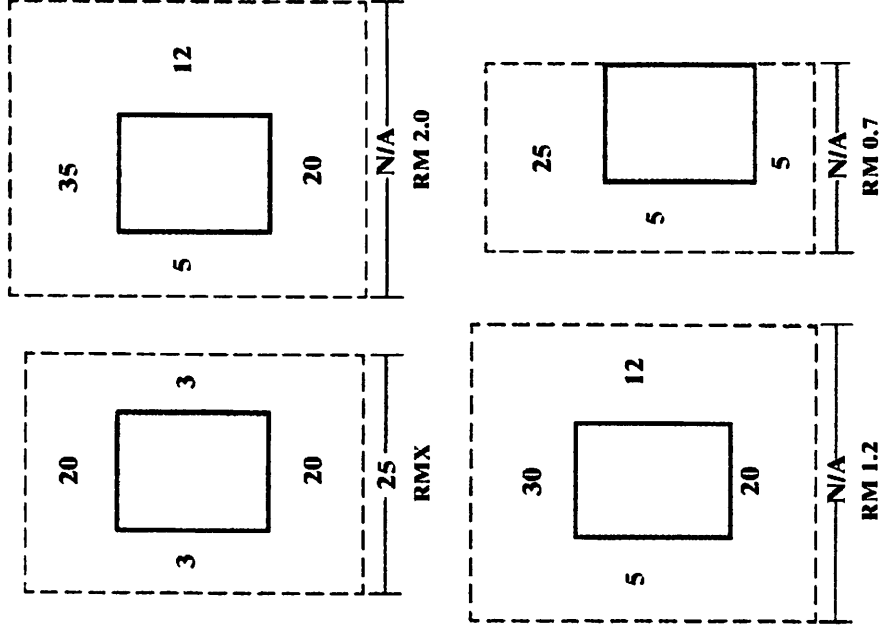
Minimum Setbacks for Multi-Family Buildings 35 ft. in Height
